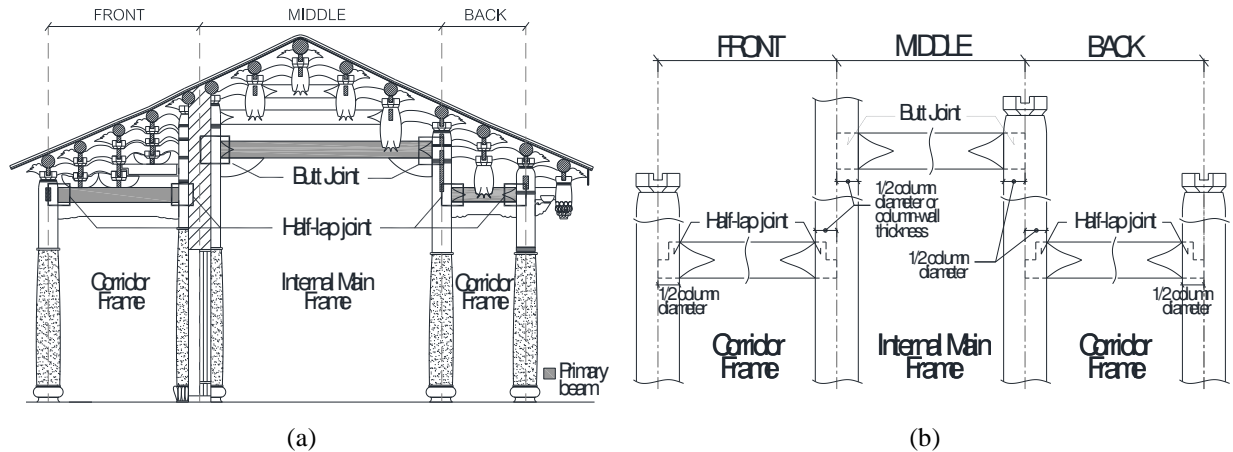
Typical Dieh-Dou timber frame showing (a) the areas where the structural resistance column-beam system and (b) its close-up of the joint designs commonly used.
